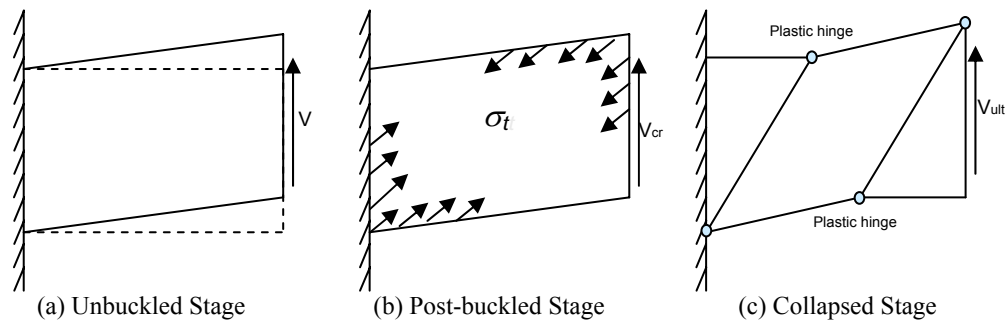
Collapse Mechanism for Plate Girders under Shear
